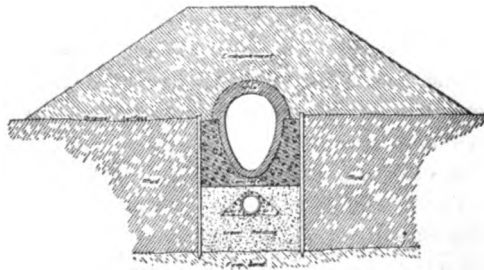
Construction of Sewers to exclude Subsoil Water (Brockton).
